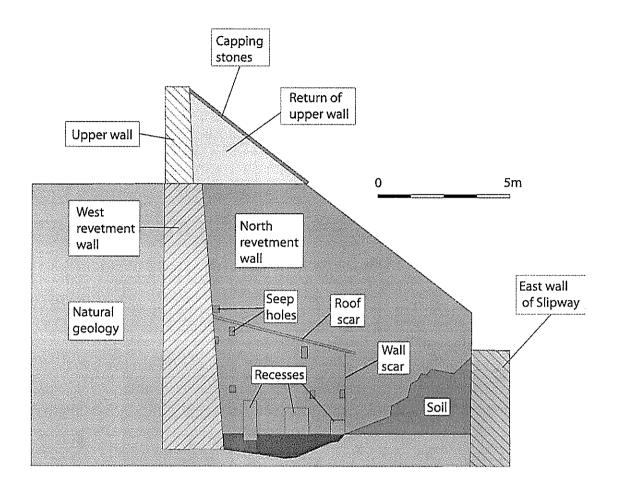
Elevation of the northern revetment wall. NB. Horizontal distances are measured, but vertical distances are estimated. The width of walls in section are not known (from Schlee 2004)
